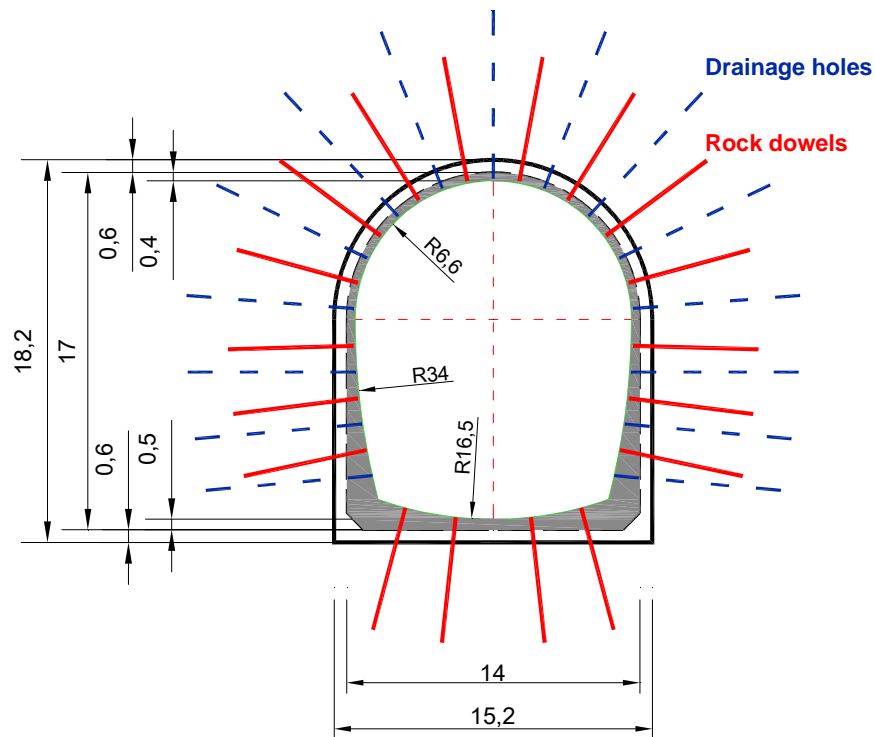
Schematic illustration of the additional support-stabilization system proposed
